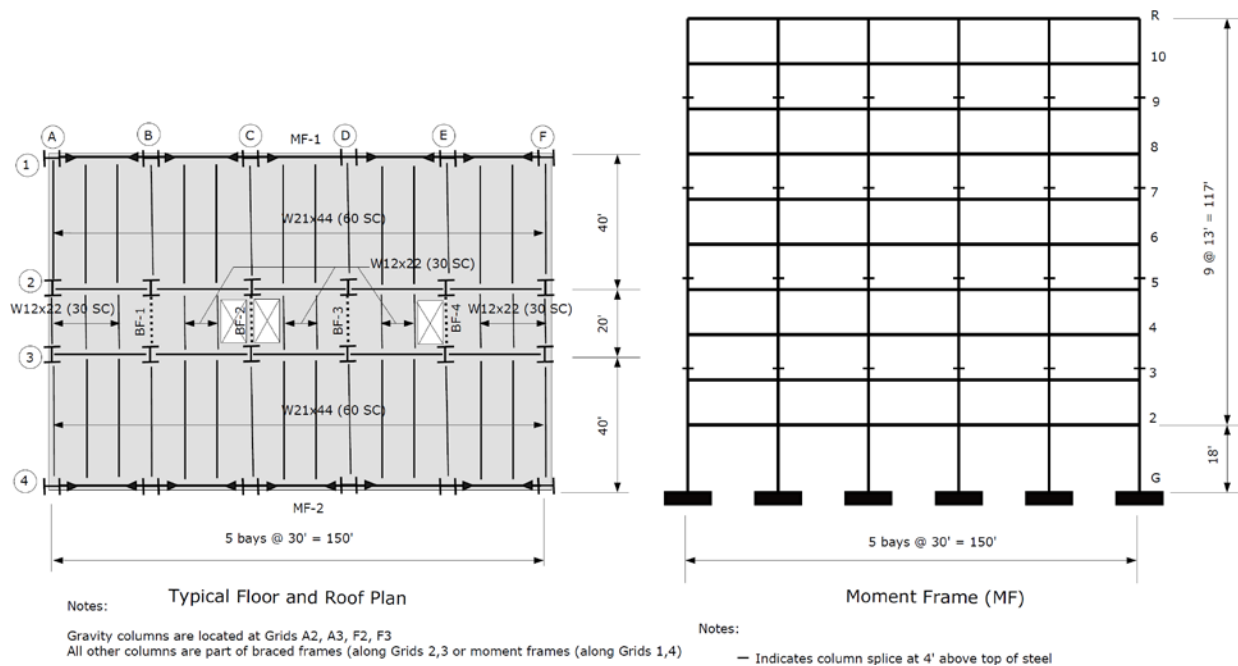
Type III non-ductile moment frame 10-story building framing plan and elevation
